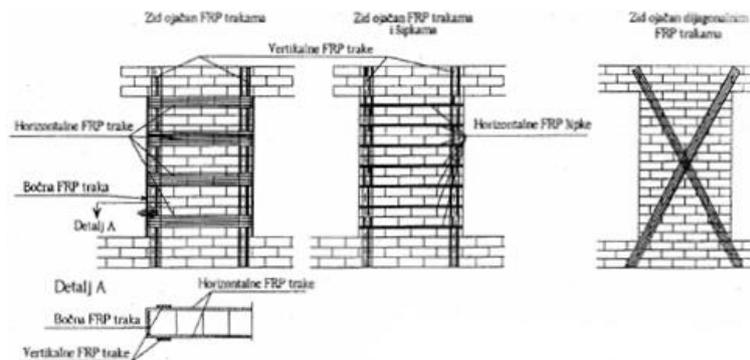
Strengthening schemes of part of wall between openings using FRP composite
